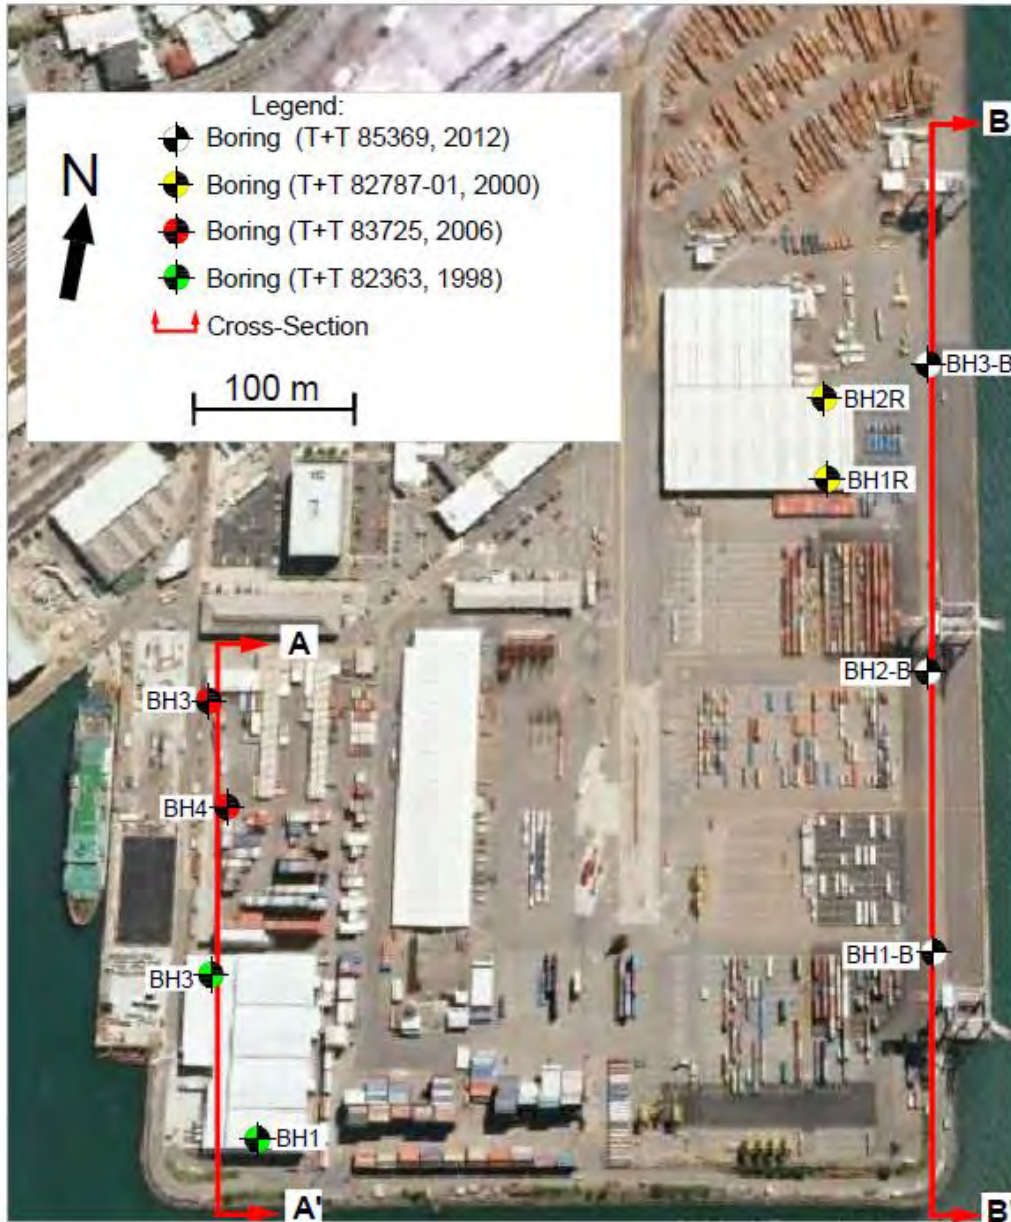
Site plan showing location of cross sections and borings used to develop the cross-sections shown in Figure 5.3; (Base image from Google Earth™).
